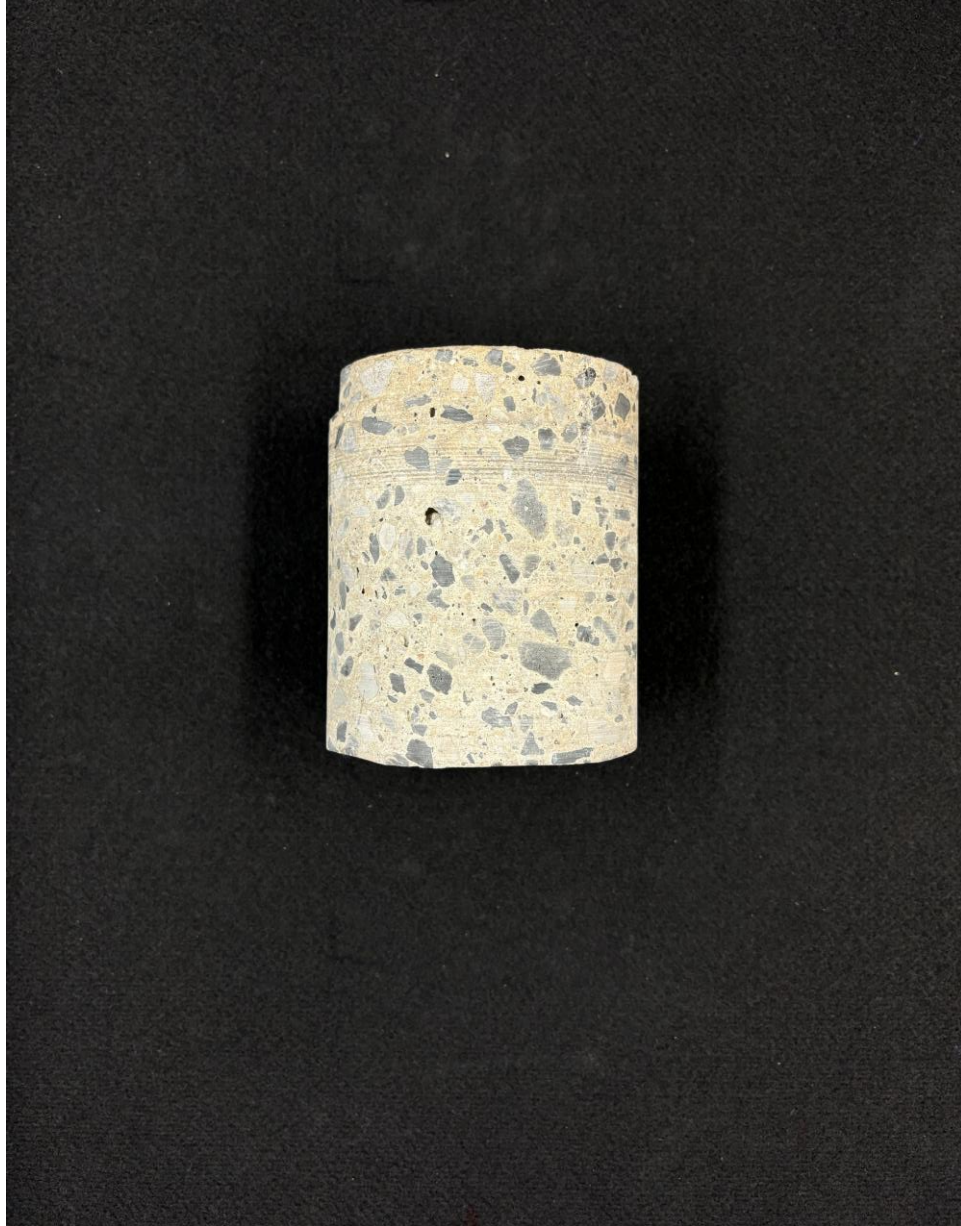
Core 3 of lightweight concrete deck at bridge C-1011.
